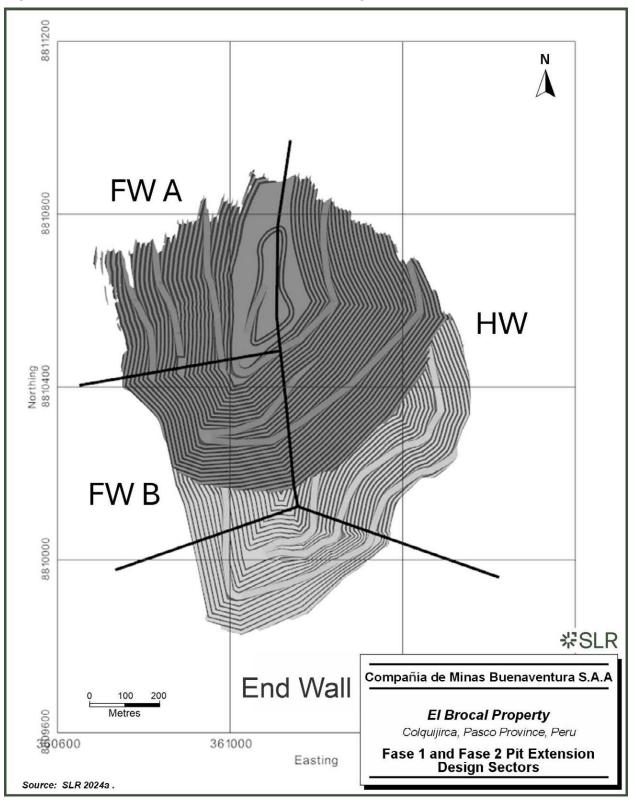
Fase 1 and Fase 2 Pit Extension Design Sectors
